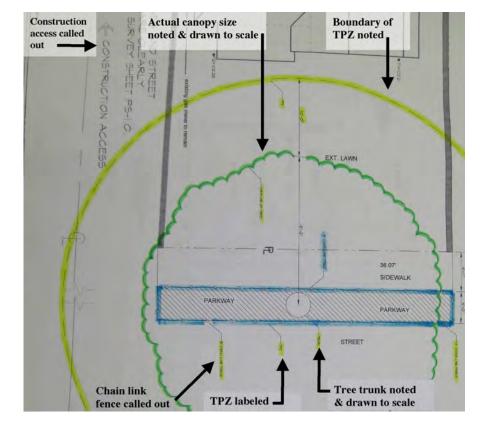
A construction plan showing the Tree Protection Zone (TPZ) in yellow and the actual canopy dimension in green.
